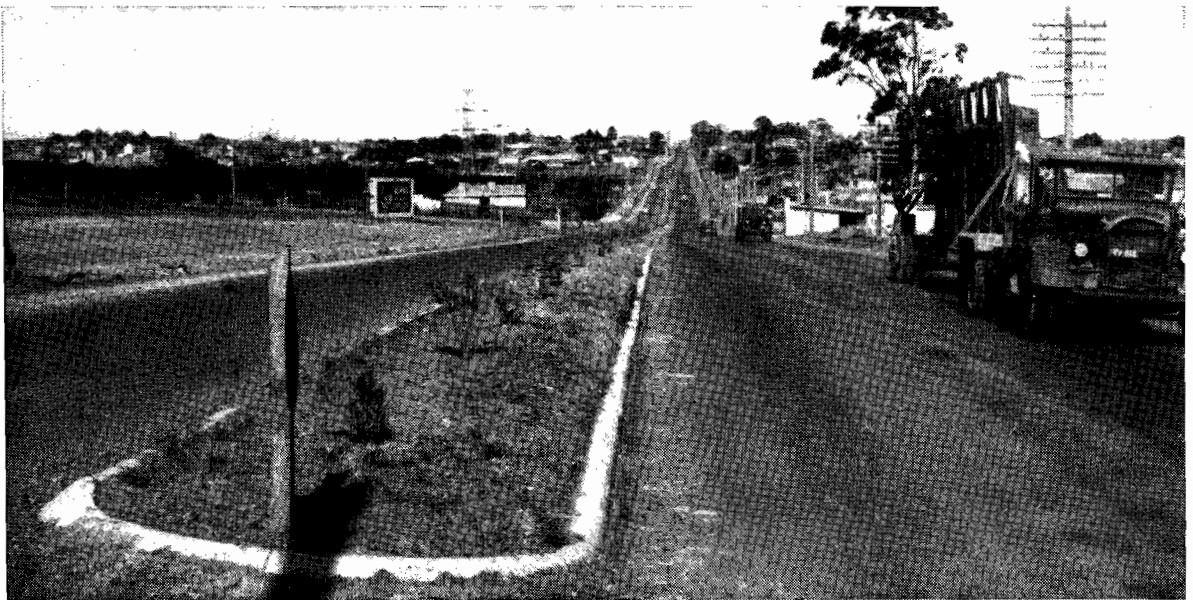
Warrigal Road showing trees planted in centre nature strip.
